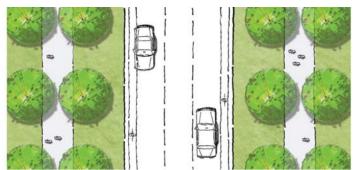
A Plan of typical three-lane Campus Greenbelt
